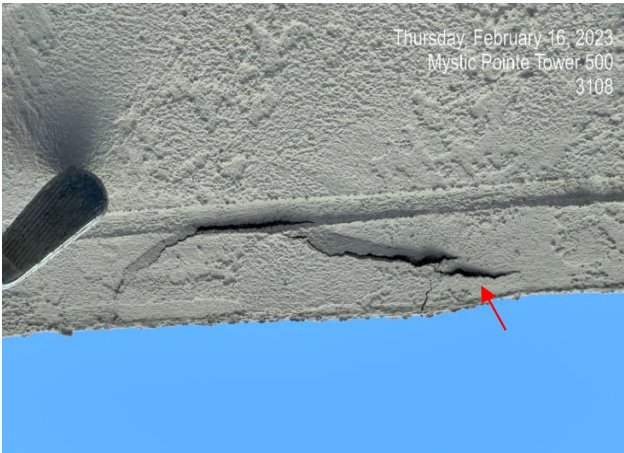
c.17 – Cracked stucco and initial stage of detachment at balcony ceiling (Unit 3108)
